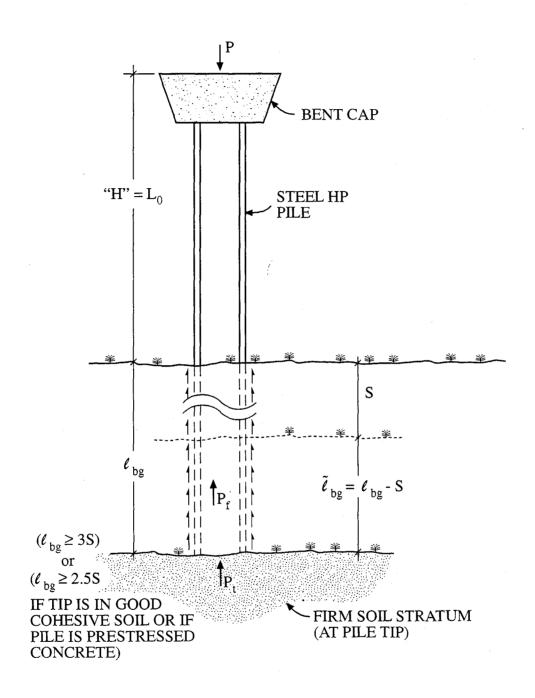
Minimum Pile-Soil Setting Conditions Needed to Prevent a Pile Plunging Failure
